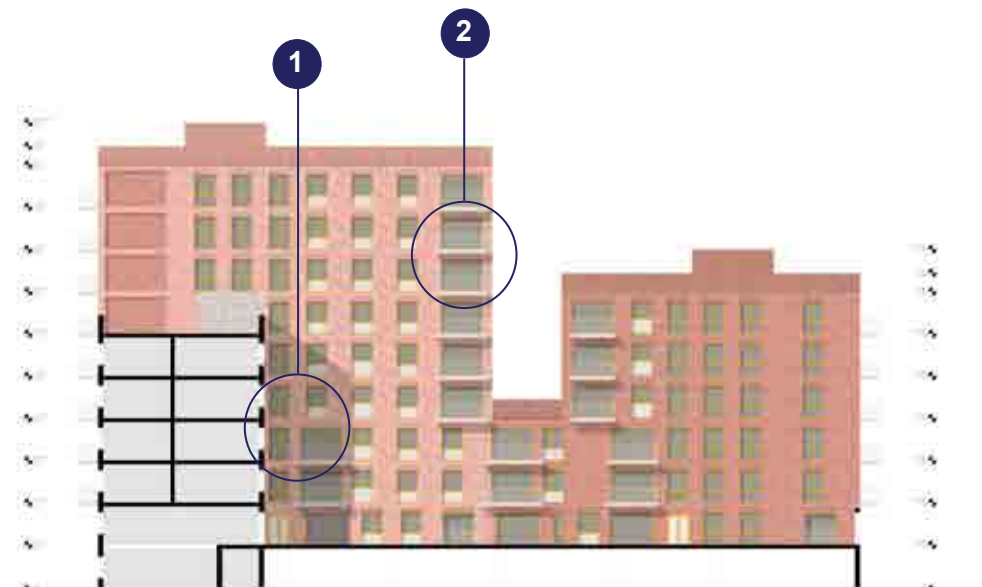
Block 4 West Elevation (Courtyard) Revised Planning Submission February 2015
